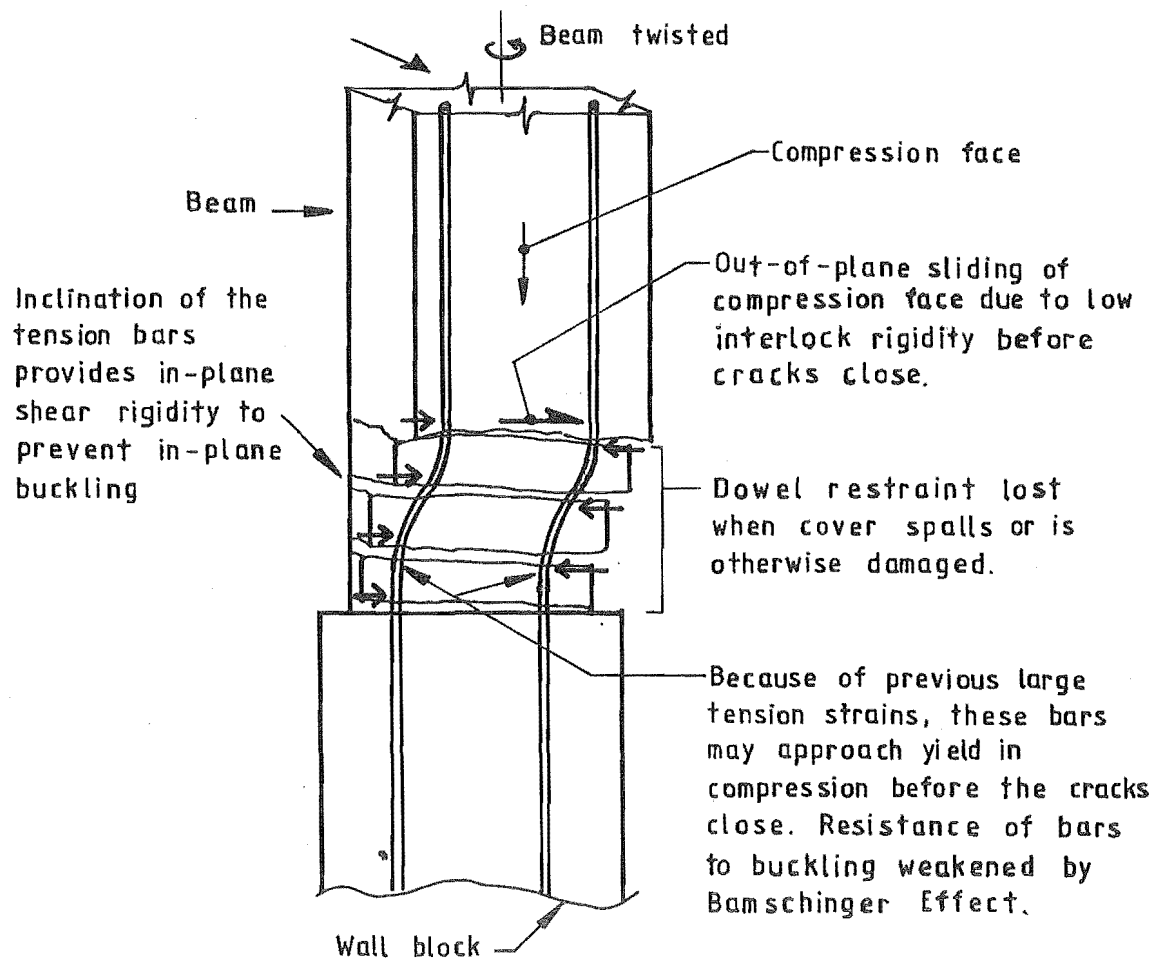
IDEALIZATION OF TORSION-BUCKLING FAILURE OF SPECIMEN TB3
